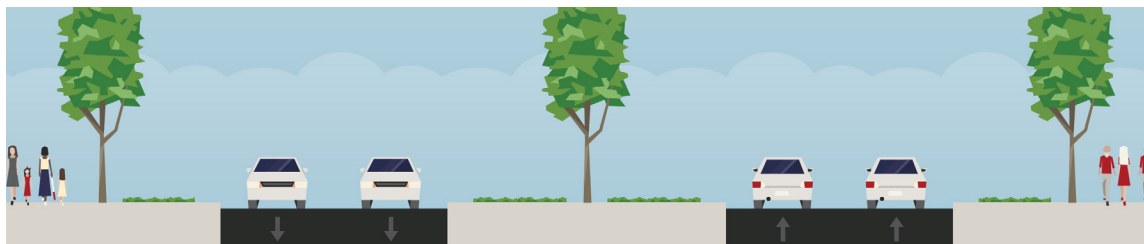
Alternative 7 4-Lane Typical Cross-Section
